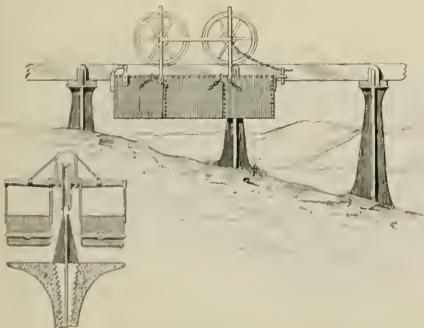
ELEVATED SINGLE TRACK ROAD, 1821.
